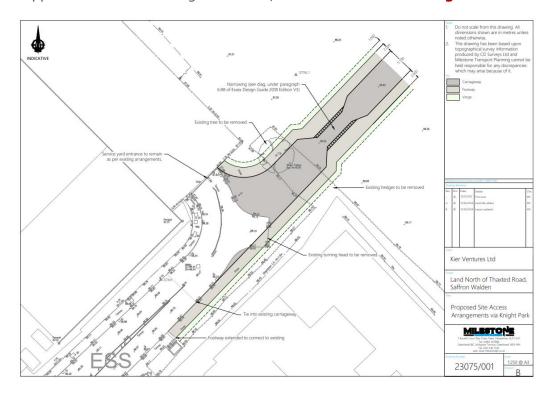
Access Drawing (Source: Milestone drg. no. 23075/001 Rev B)
